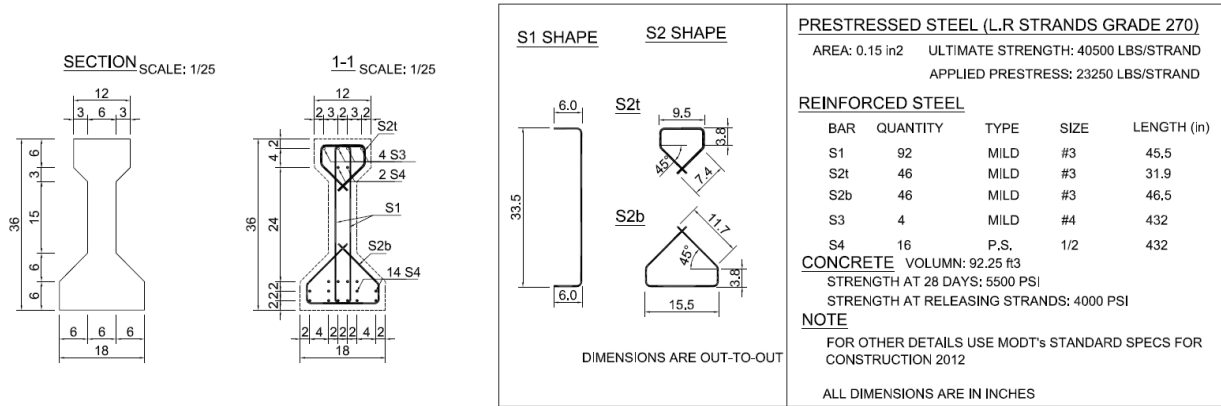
Girder 2 cross section details (dimensions in inches)
